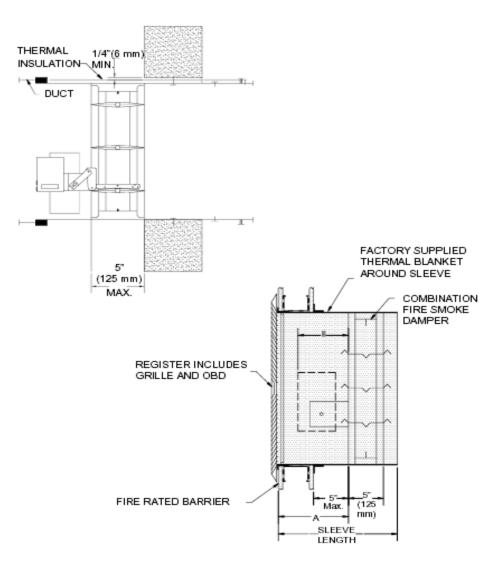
FIRE DAMPER OUT OF WALL
